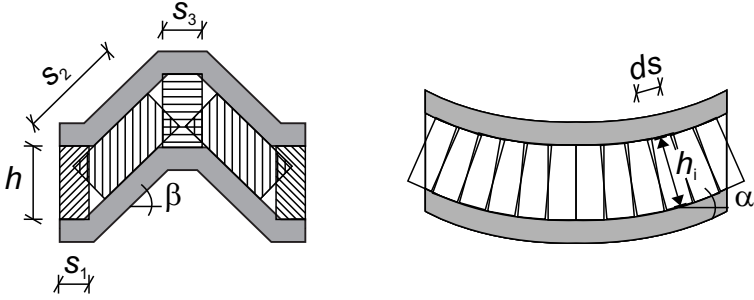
Subdivision of tested folded plate and curved cross-sections
